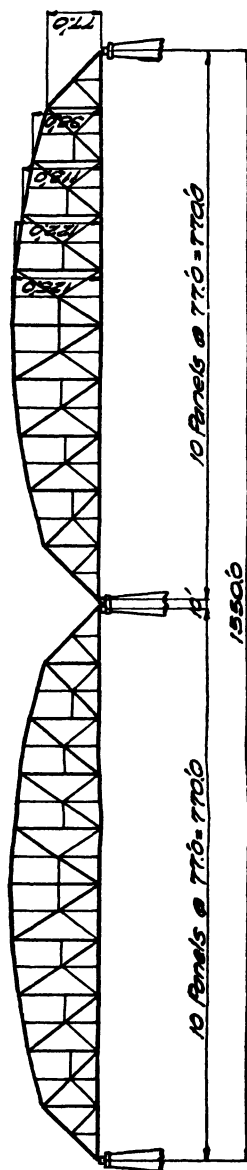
Layout of Petit-Truss, Non-Continuous Spans.
